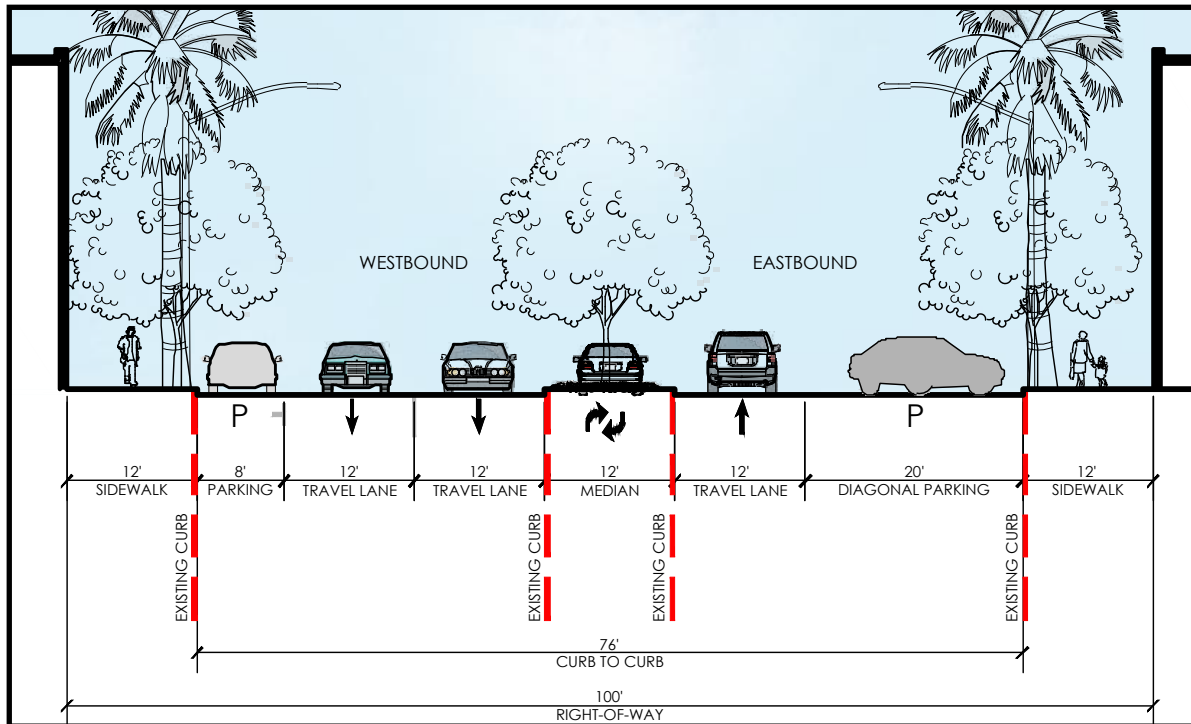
, Grand Avenue: Existing Conditions Section between Roosevelt Street and Madison Street
